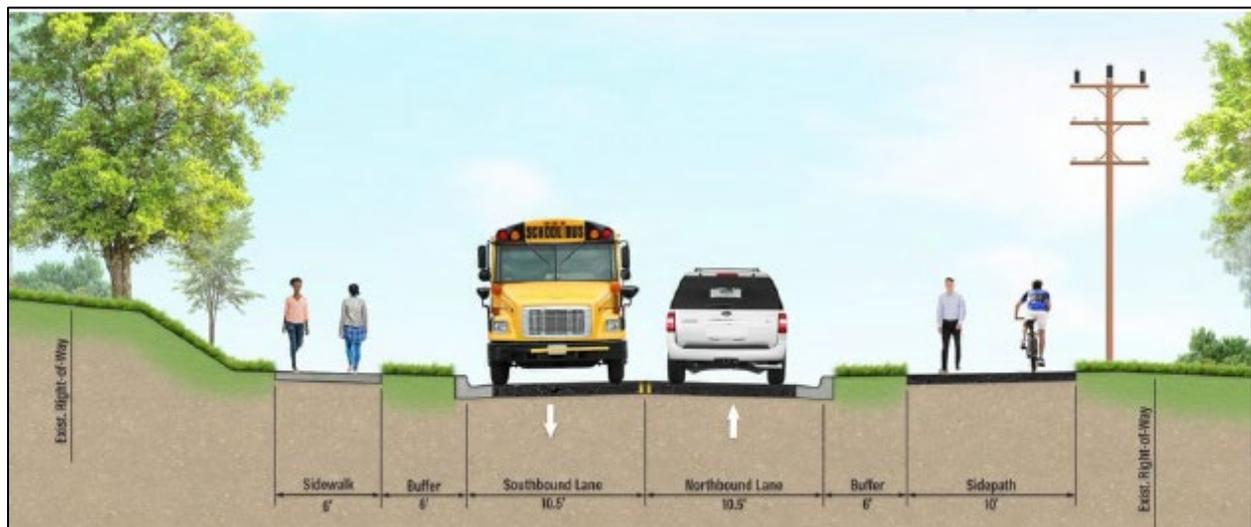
Alternative 3 - Old Columbia Pike Typical Cross Section
